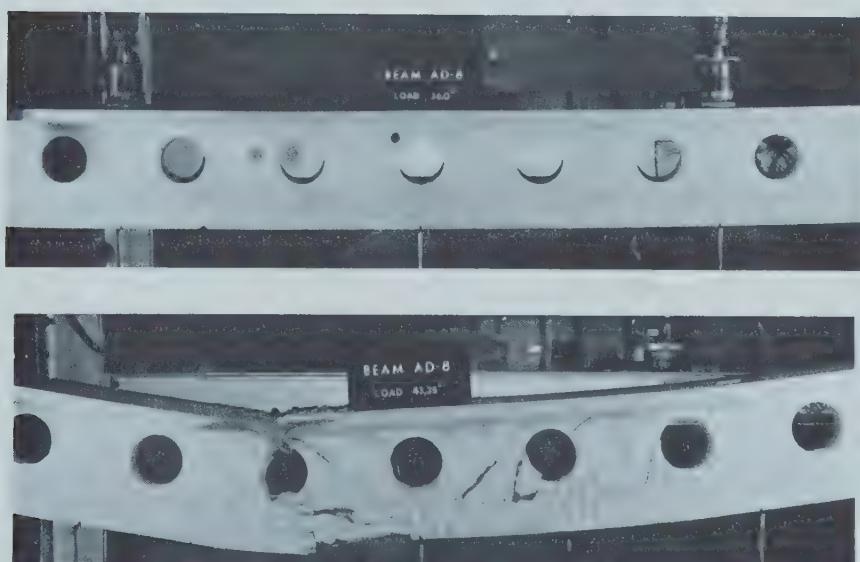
BEAM AD-8 CRACKING AND FAILURE PATTERNS
